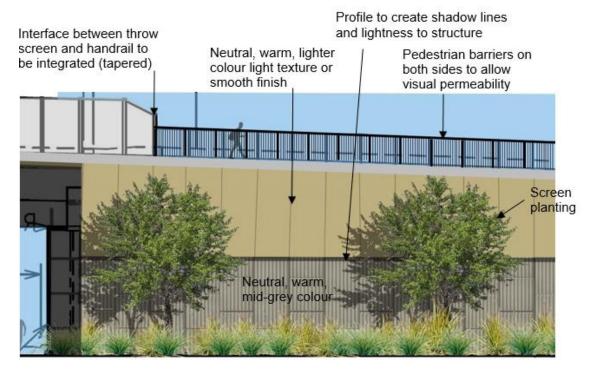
Elevation of the RSW design proposal at the rail overbridge (NTS)
